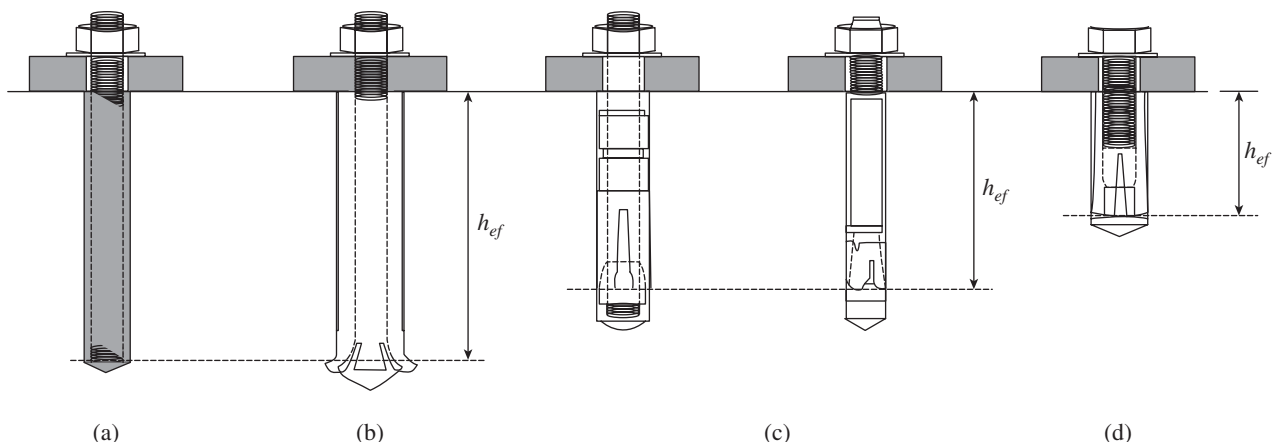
Post-installed anchors (a) Adhesive or bonded anchor (b) Undercut anchor (c) Torque-controlled expansion anchors—sleeve and stud types (d) Drop-in type displacement-controlled expansion anchor
